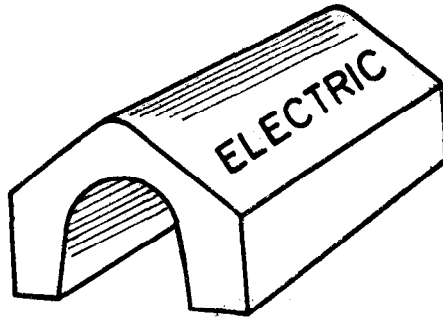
TYPICAL ARCH TYPE CABLE COVER
